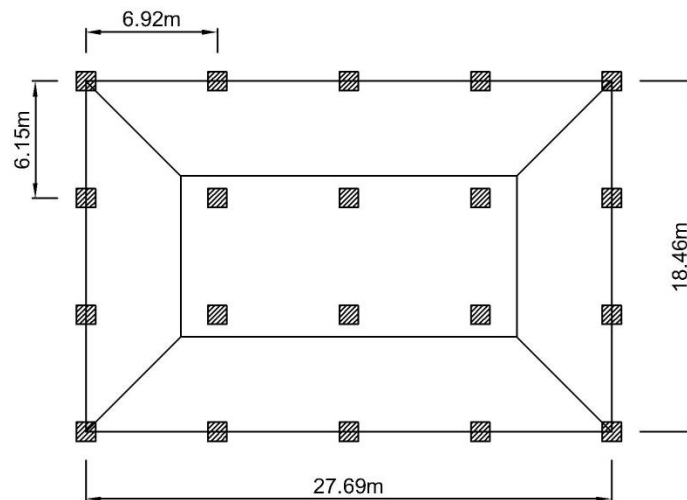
Location of foundation piles for the case study office building in New York, NY
